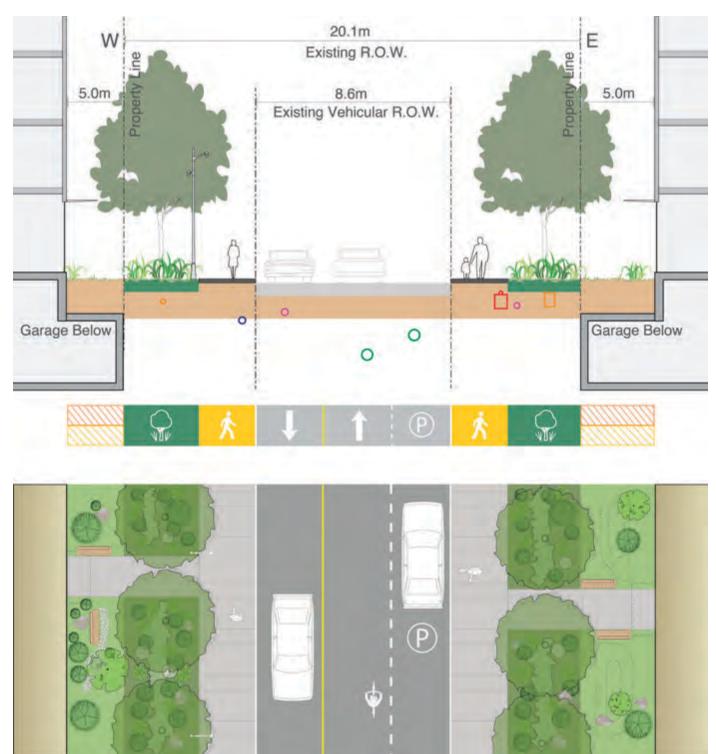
Section and Plan of Redpath Revisited - Recommended Final Condition from Erskine Avenue to Roehampton Avenue and from Eglinton Avenue to Soudan Avenue
